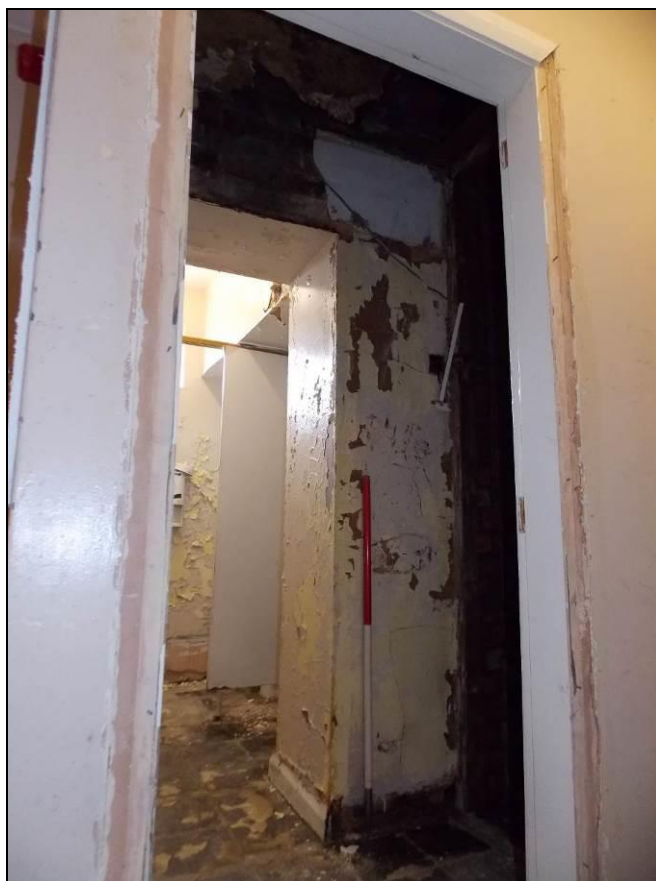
Corridor with doorways to lavatories, looking south (scale 1m).
